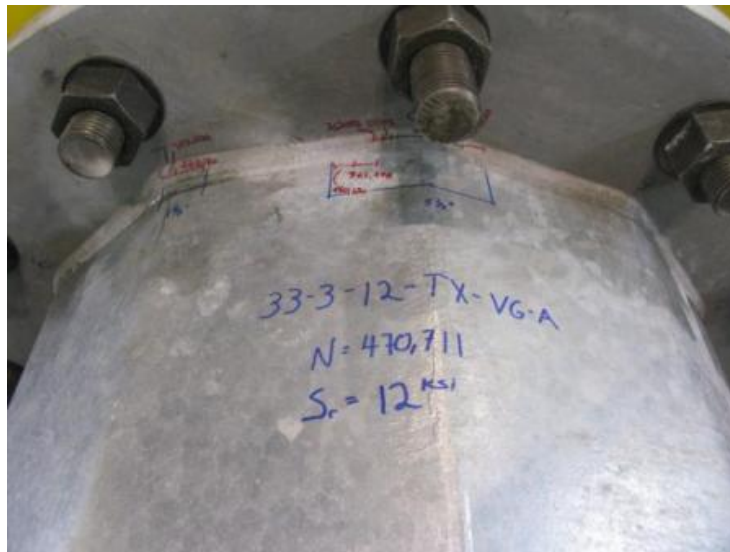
Specimen 33-3-12-TX-VG-A after Fatigue Testing
